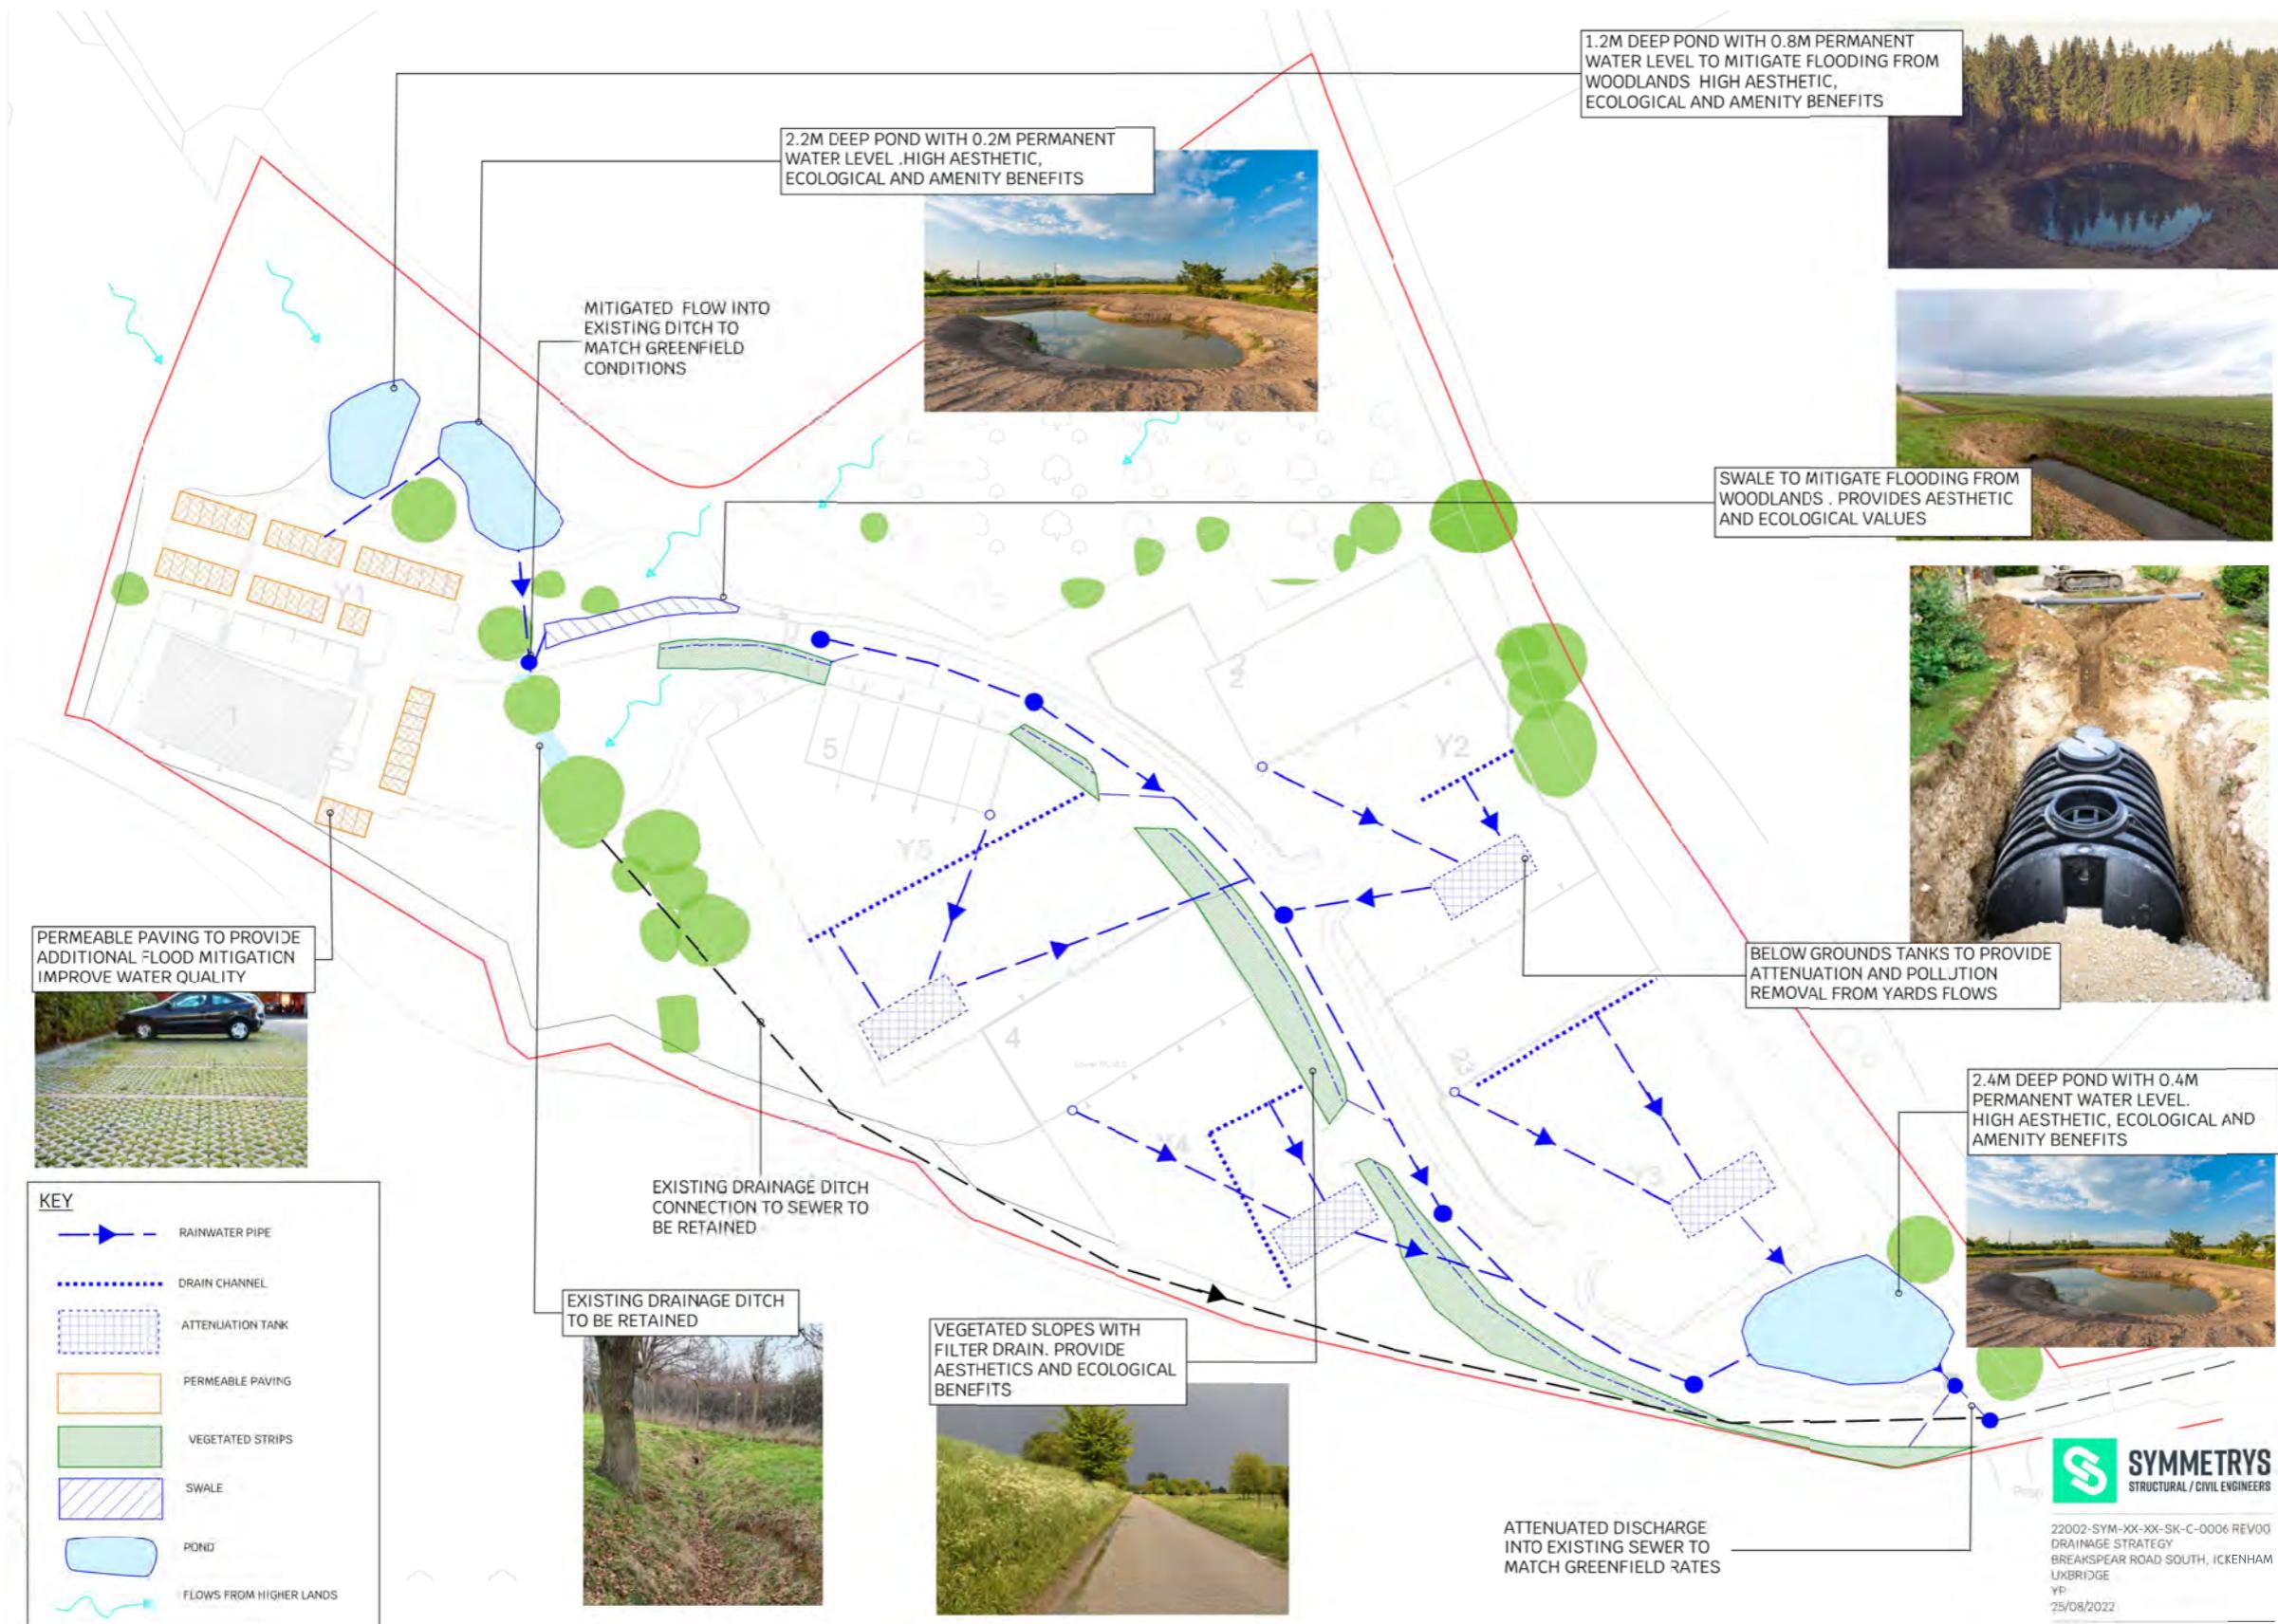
Proposed Site plan and its proposed strategic approach.
